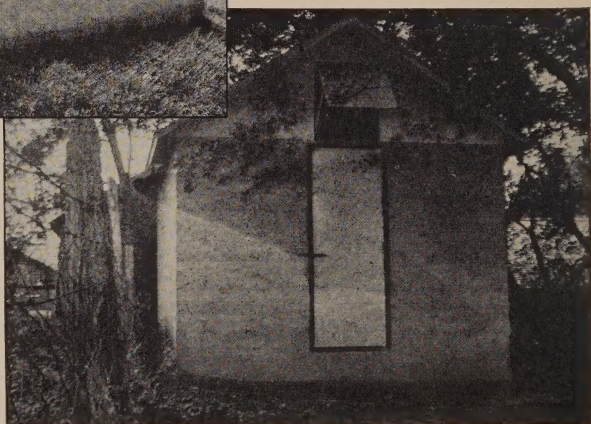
At right: Small concrete ice house with wood gable and roof. Concrete is rot-proof and fire-proof—very desirable qualities in an ice house.
